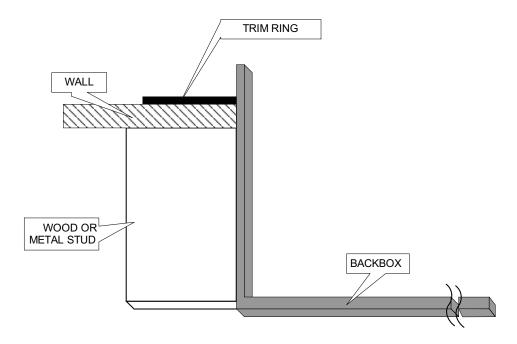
Cross-Section of the BBX-1024XT Flush Mounted Box with FA-XT-TRB Trim Ring
